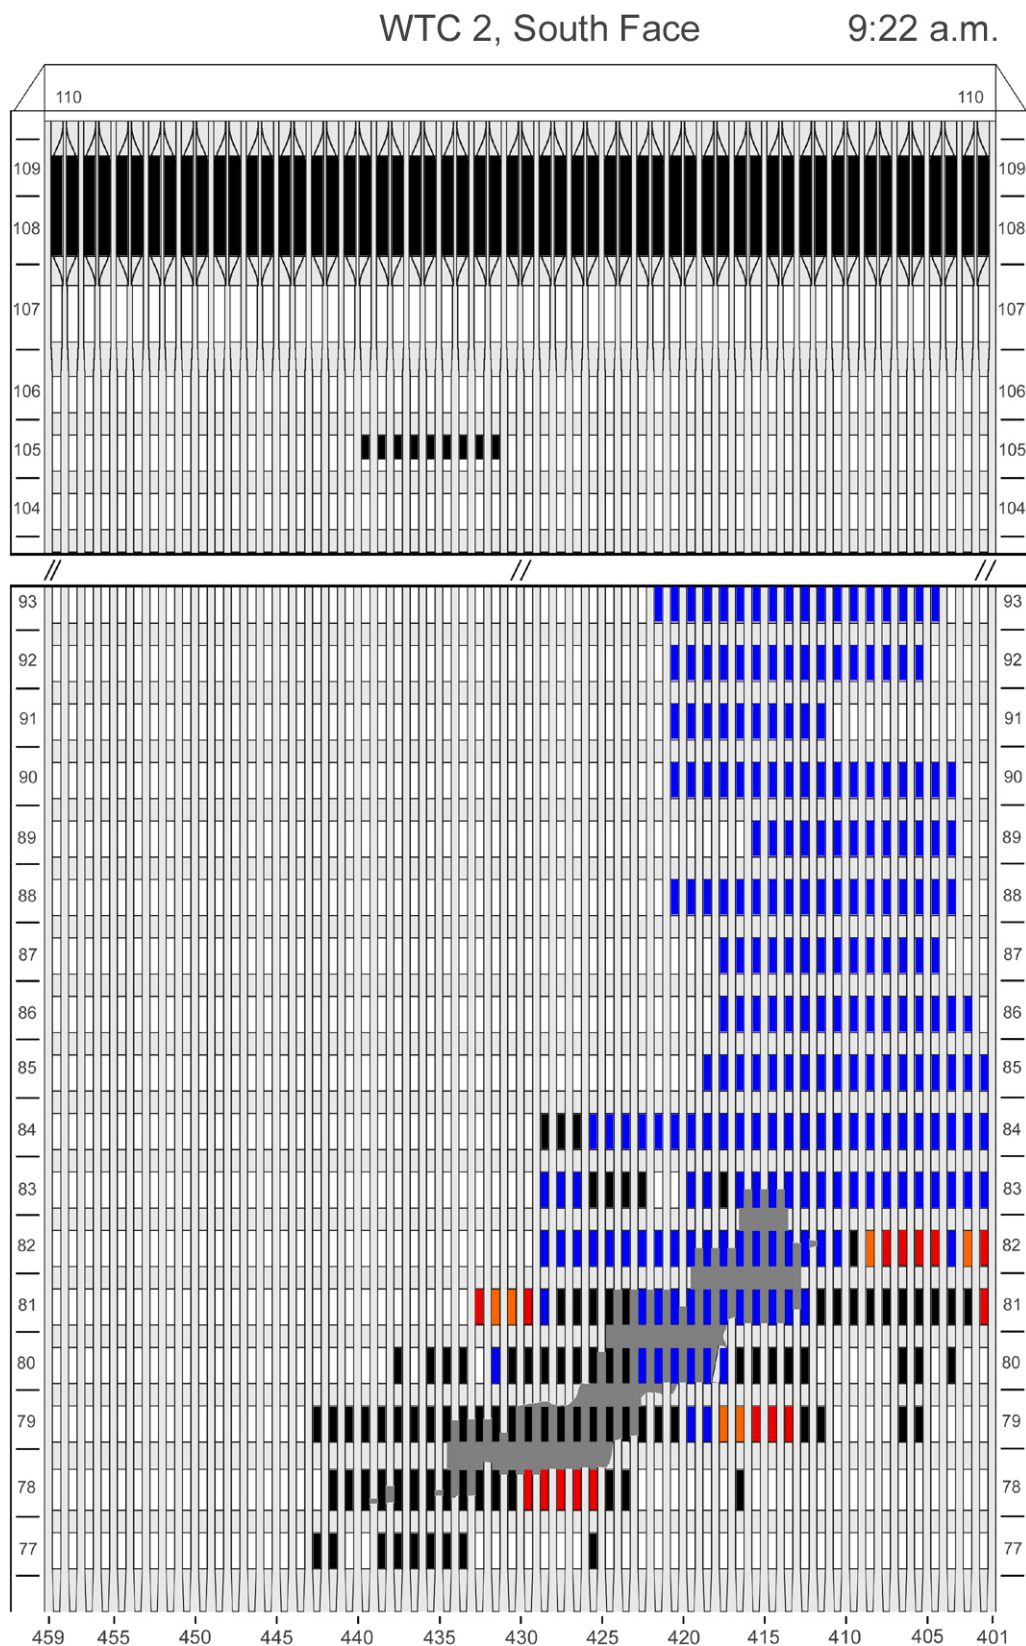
Diagram of the south face of WTC 2 for floors 77 to 93 and floors 104 to 110 at 9:22 a.m. showing the condition of windows and locations of fires.
